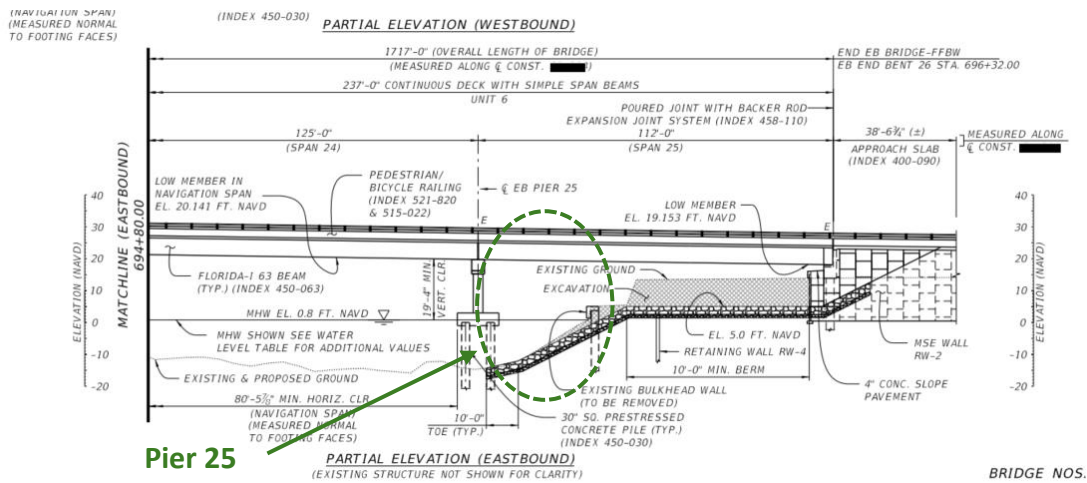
Partial elevation – Selected Pier no.25 of the Eastbound Bridge (B1-12)
